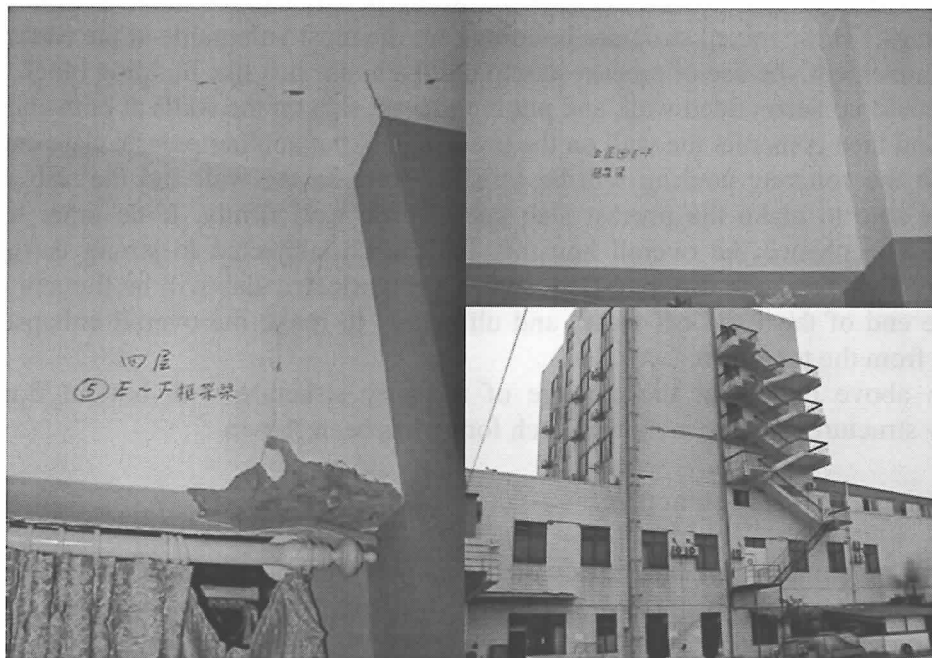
Beam damage of frame structure in Mianzhu
